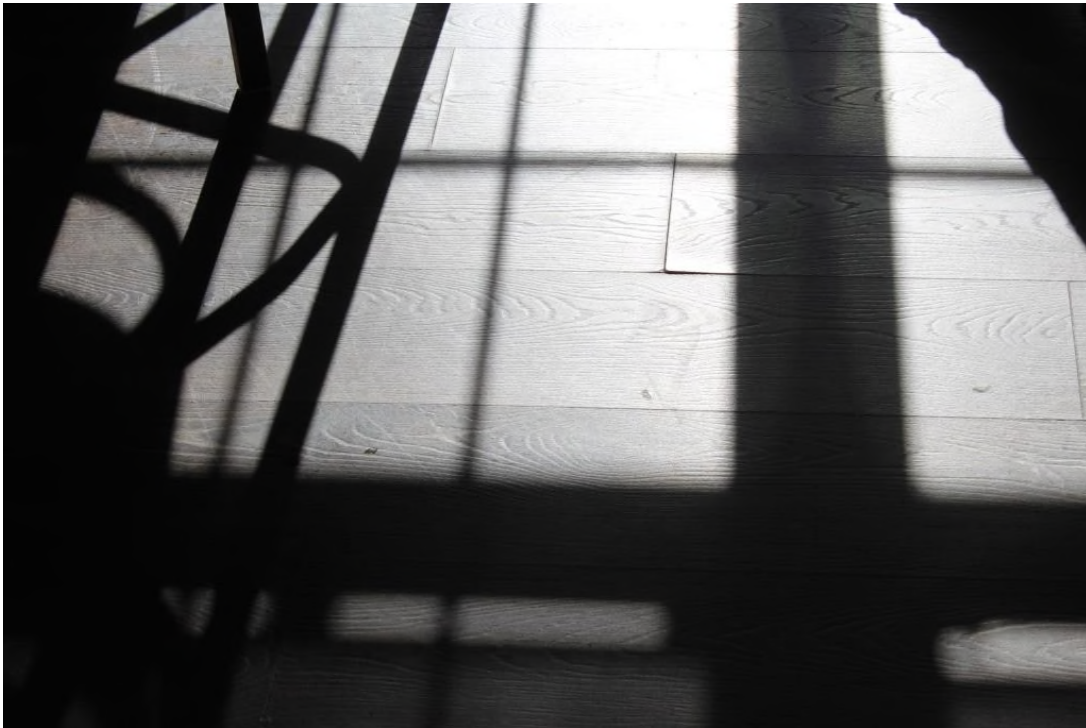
Vinyl flooring peeling up. Typical throughout.
